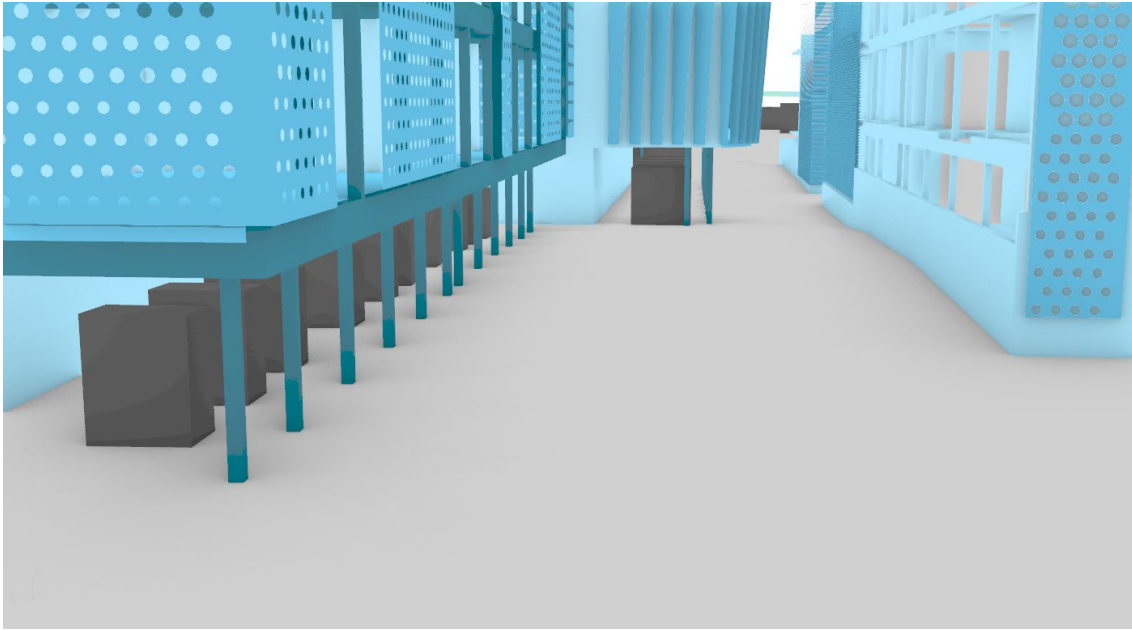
West perspective view of the modelled existing site and surrounding buildings.
